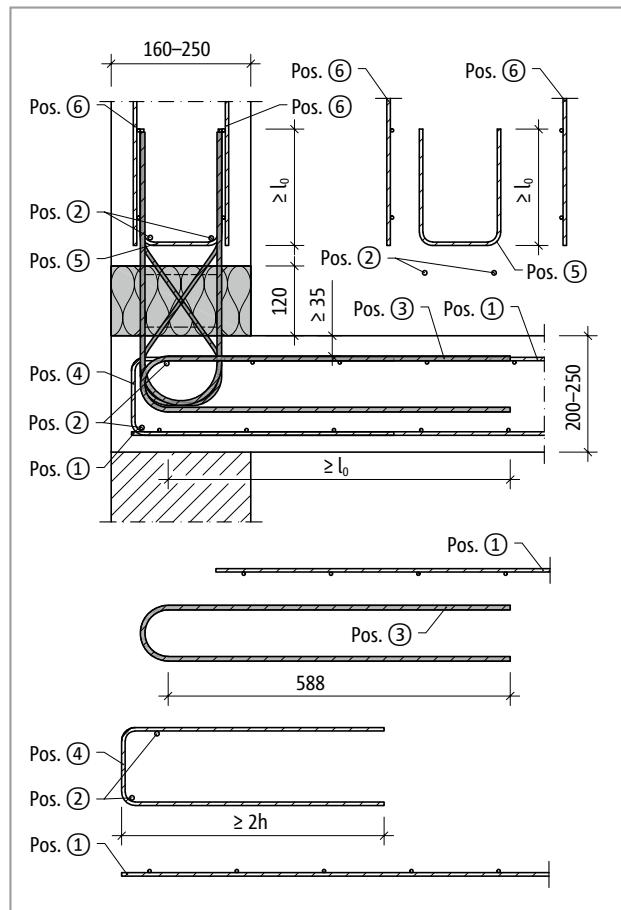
Schöck Isokorb® XT type A: On-site reinforcement outside
